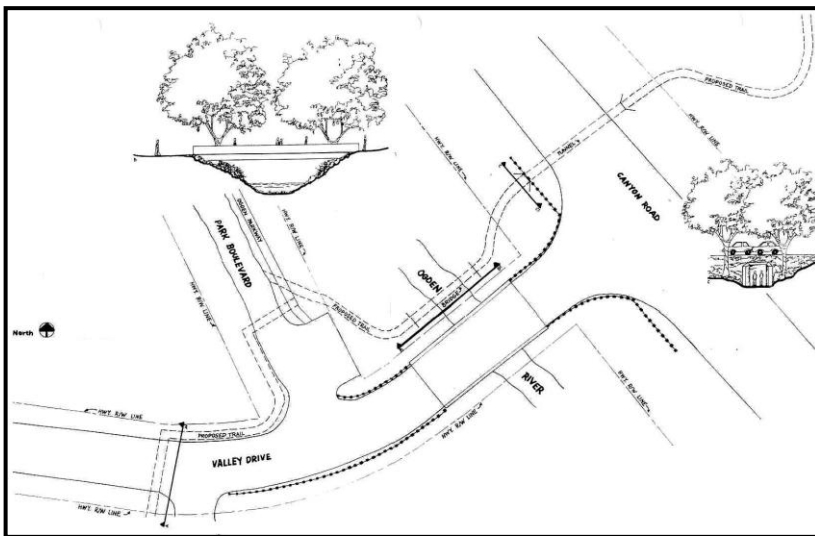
Schematic of tunnel crossing and connection of the Bonneville Shoreline Trail under Canyon Road
